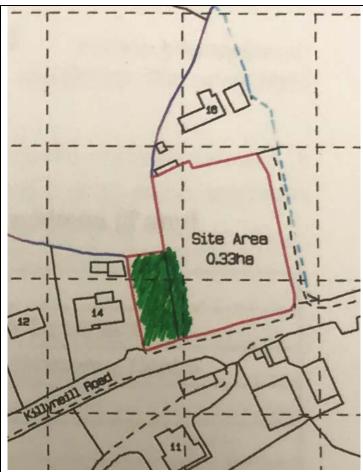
Drawing submitted by the applicant to demonstrate where they would prefer the proposed dwelling sited.
